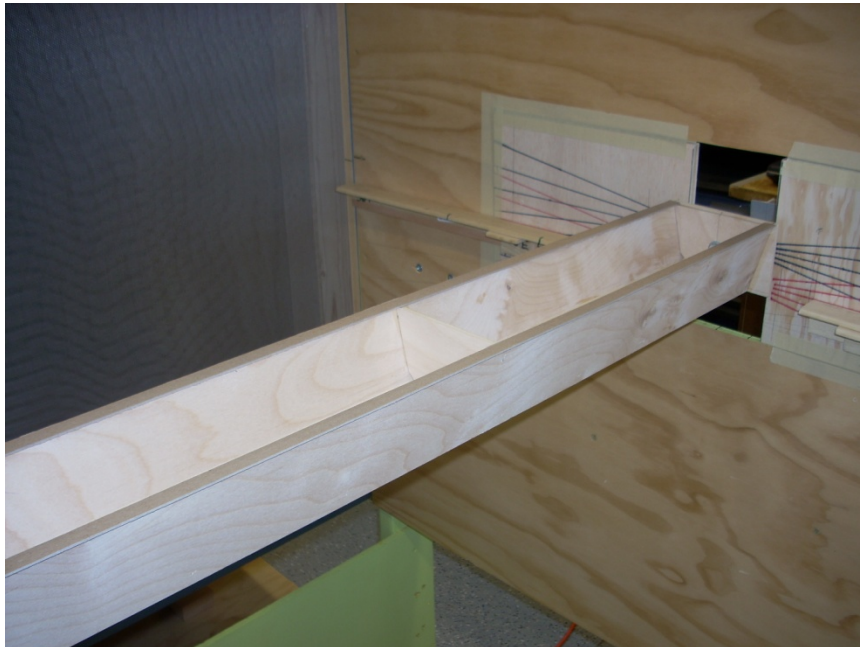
Tall Open-Topped Box-Girder (Shape 3)
